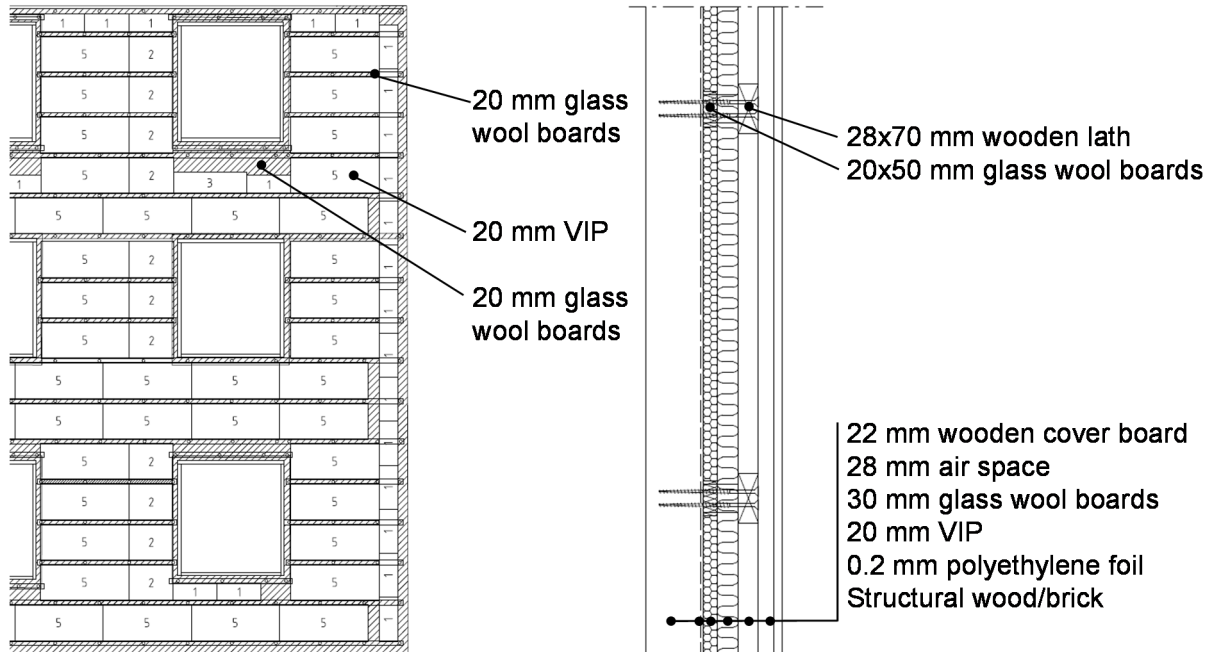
Wall layout after retrofitting with 20 mm VIPs and 30 mm glass wool boards.
